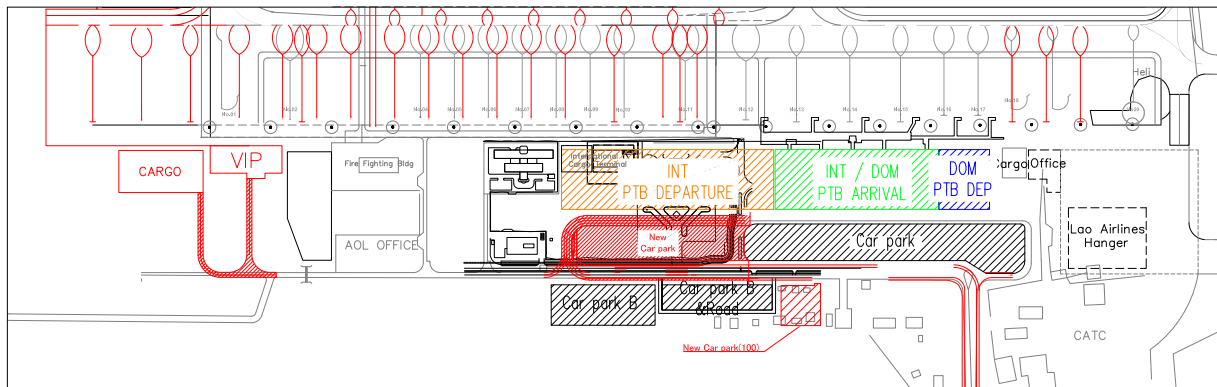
Case-4 Improvement Plan of Terminal Area
